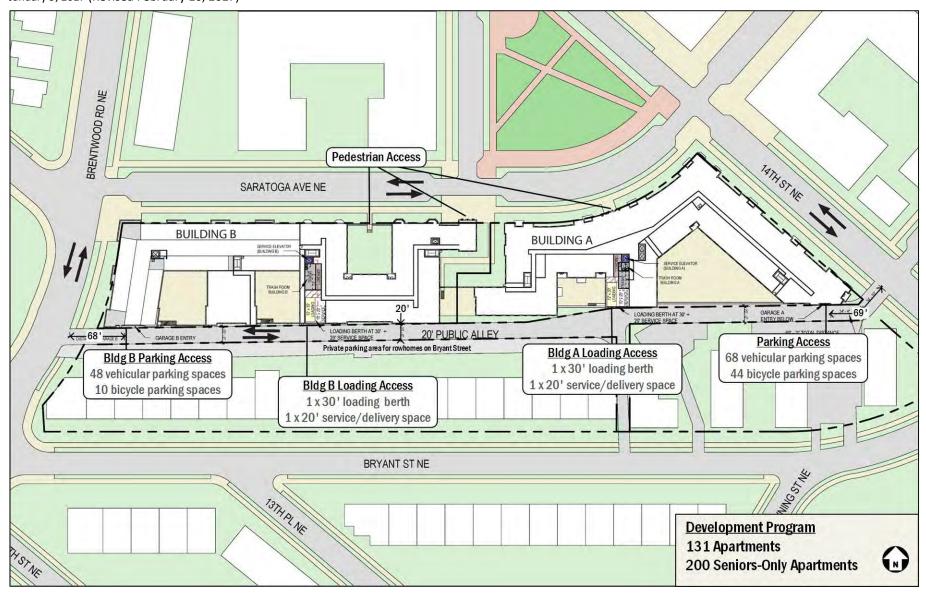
Block 7 Stage 2 Site Plan (per ZC Case 14-18A)
